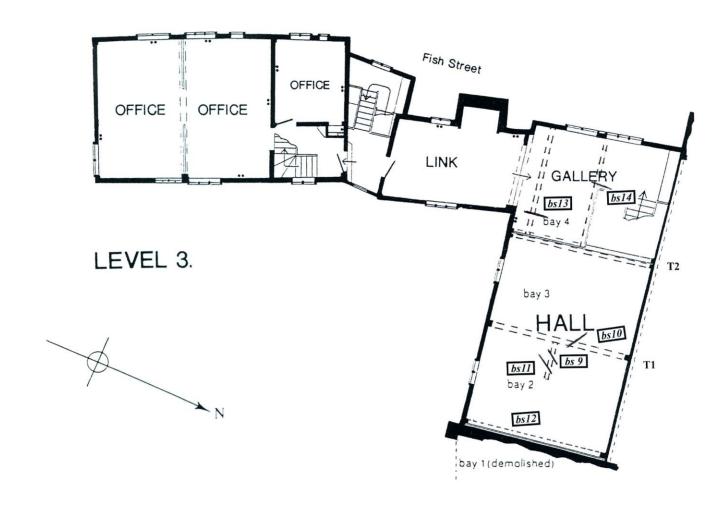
First-floor plan, showing the location of timbers sampled in Bear Steps Hall, Gallery, and The Orrel (after Moran 1989 © Shrewsbury Civic Society)
